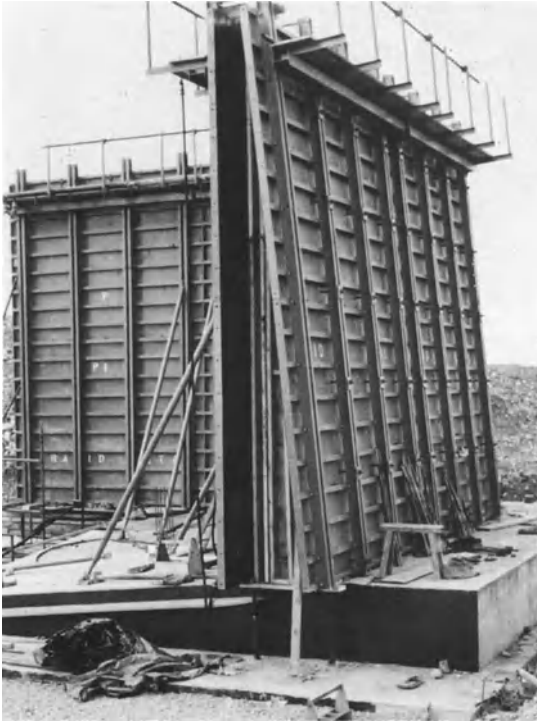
Well-designed steel shuttering for a single-lift wall pour of concrete. Safety regulations require full boarding and a toeboard to the access walkway
